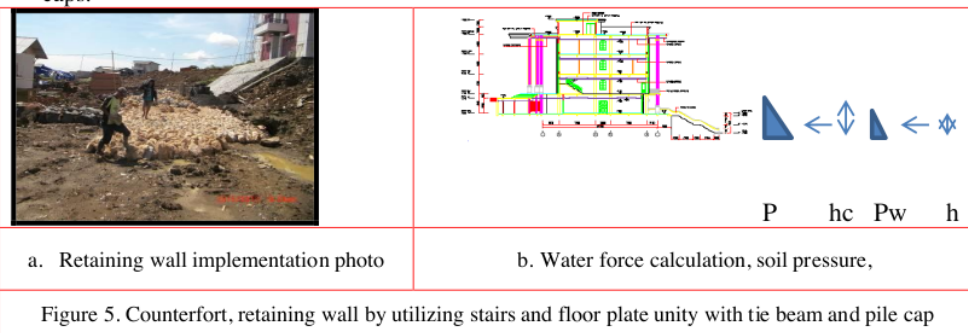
Counterfort, retaining wall by utilizing stairs and floor plate unity with tie beam and pile cap
